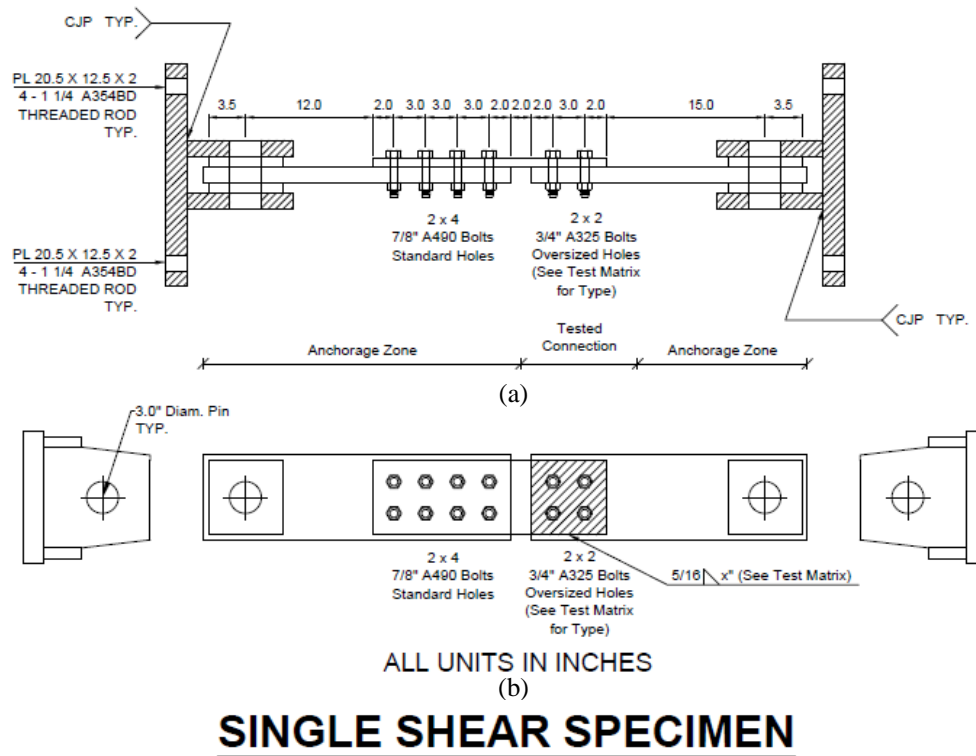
Single Shear Test Specimen (a) Elevation view (b) Plan view
